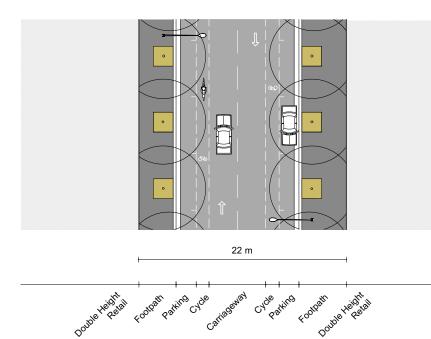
Herb Elliott Avenue – Typical Section and Plan View East
